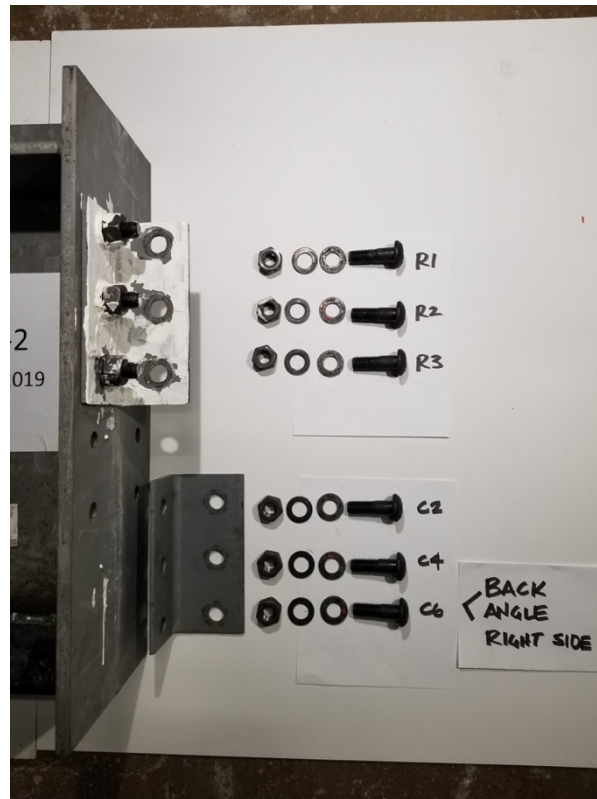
Typical right-hand-side of a 2L3 series specimen following testing.
